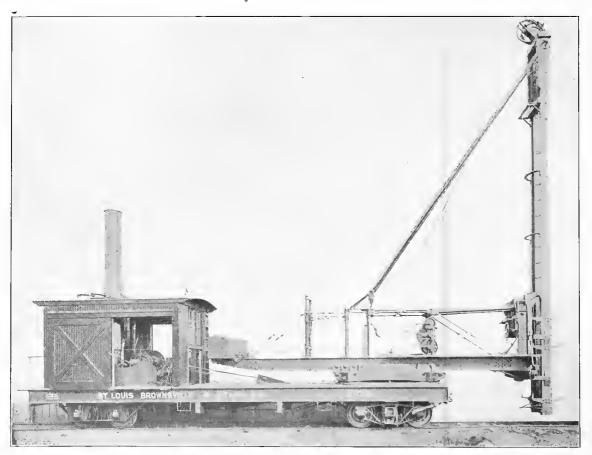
Pile-Driving Car. St. Louis, Brownsville & Mexico. Industrial Works, Builders.
